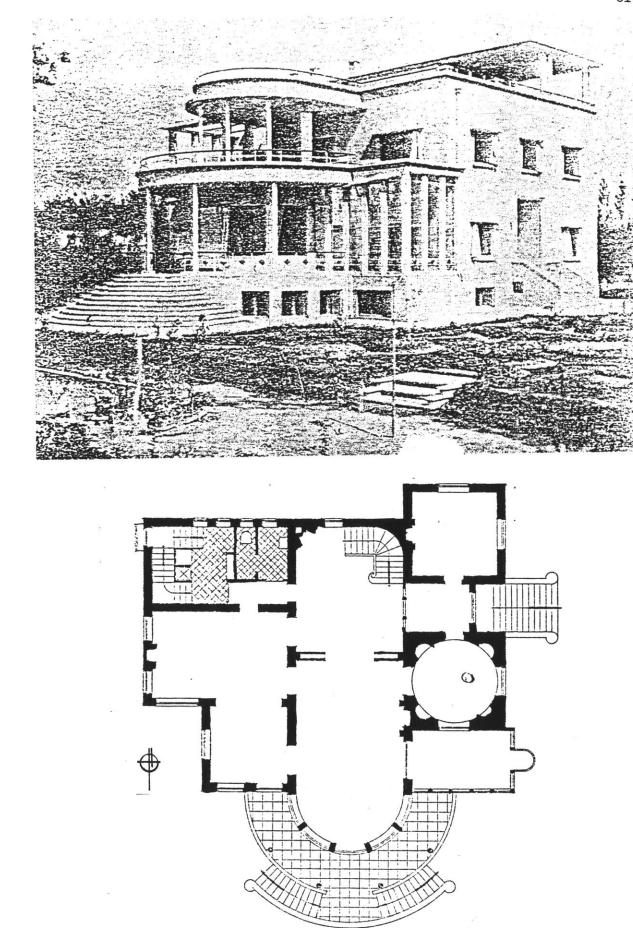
Elevation and plan of Foroughi's villa in Tehran
